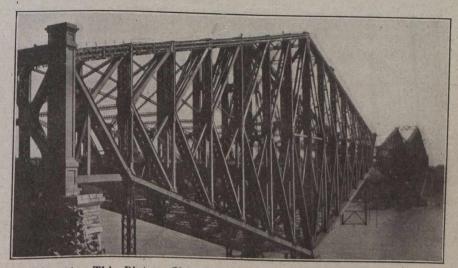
This Picture Shows Clearly the K Truss Construction.
